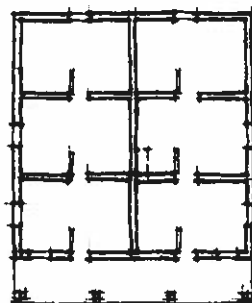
The Double Shotgun. Floor plan from the Tenth Street Historic District.
